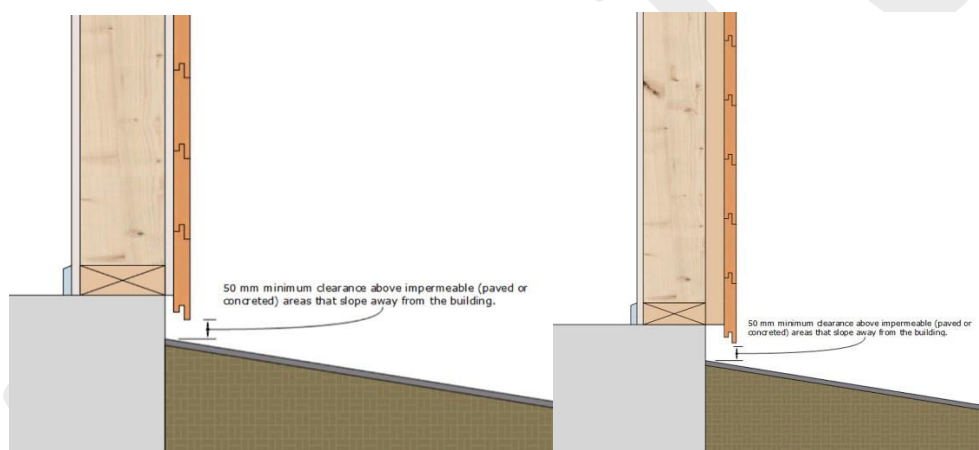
Minimum clearance of cladding above final ground levels and finishing below the bottom plate
